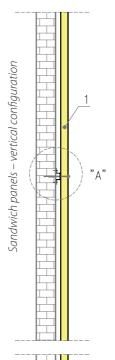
IzoPanel PIR/PIR+; MWF; EPS - sandwich panels - assembly to wall (masonry of rainf. concrete)
